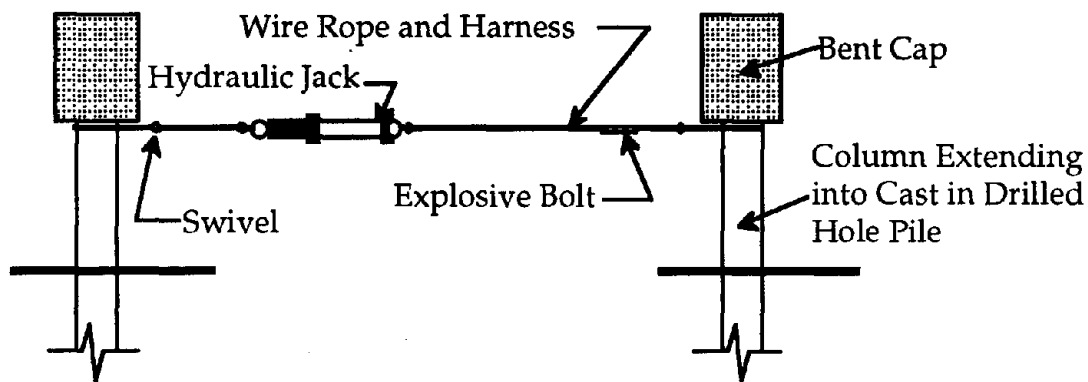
Mechanism Used to Achieve Snap Back Vibration Experiment for Bridge Columns
